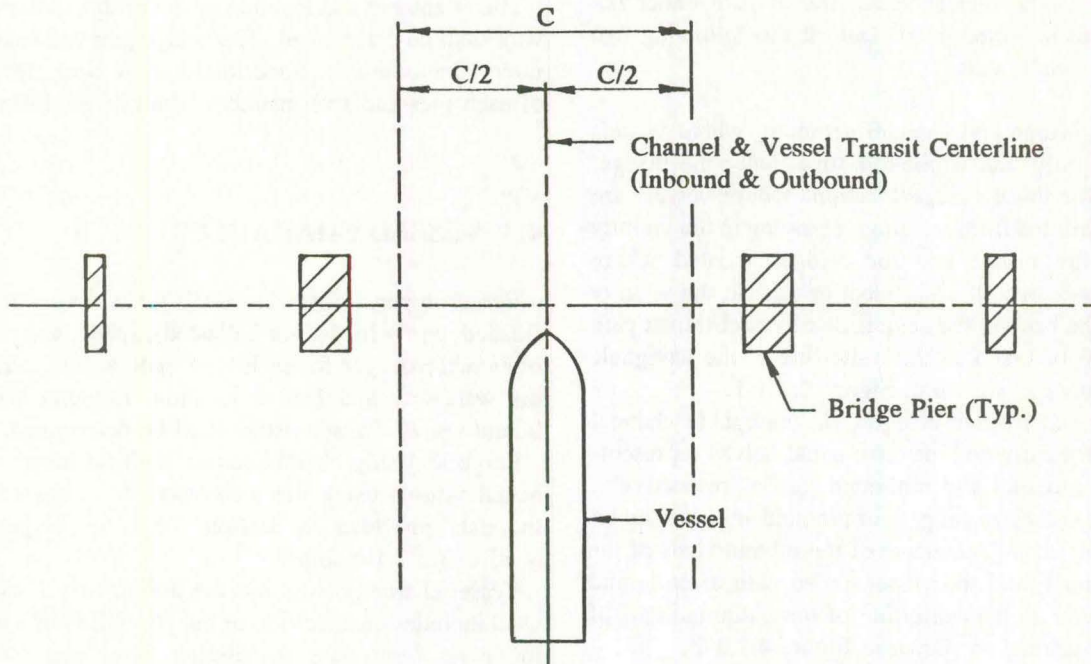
Single Transit Path in Channel Through Bridge.
